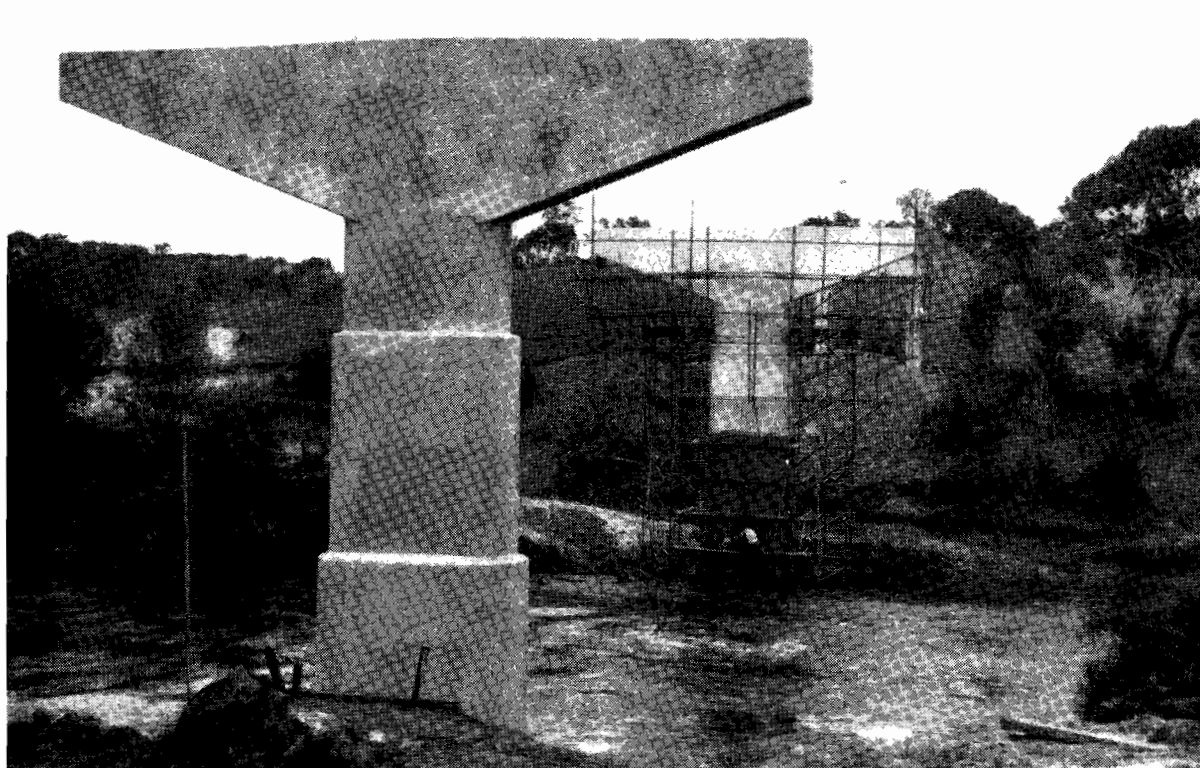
Shires of Doncaster and Templestowe and Eltham. Bridge over Yarra River, Doncaster—Eltham Road, Templestowe, in course of construction.
